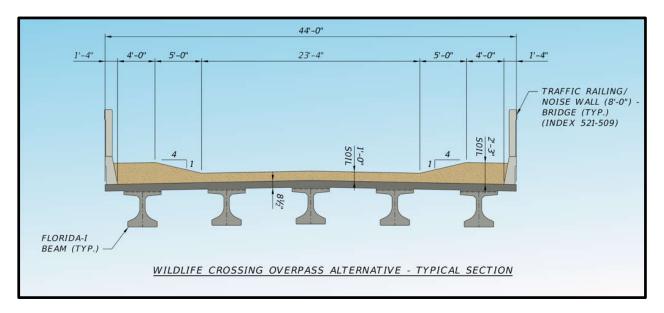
Design Alternative C Wildlife Overpass Typical Section
